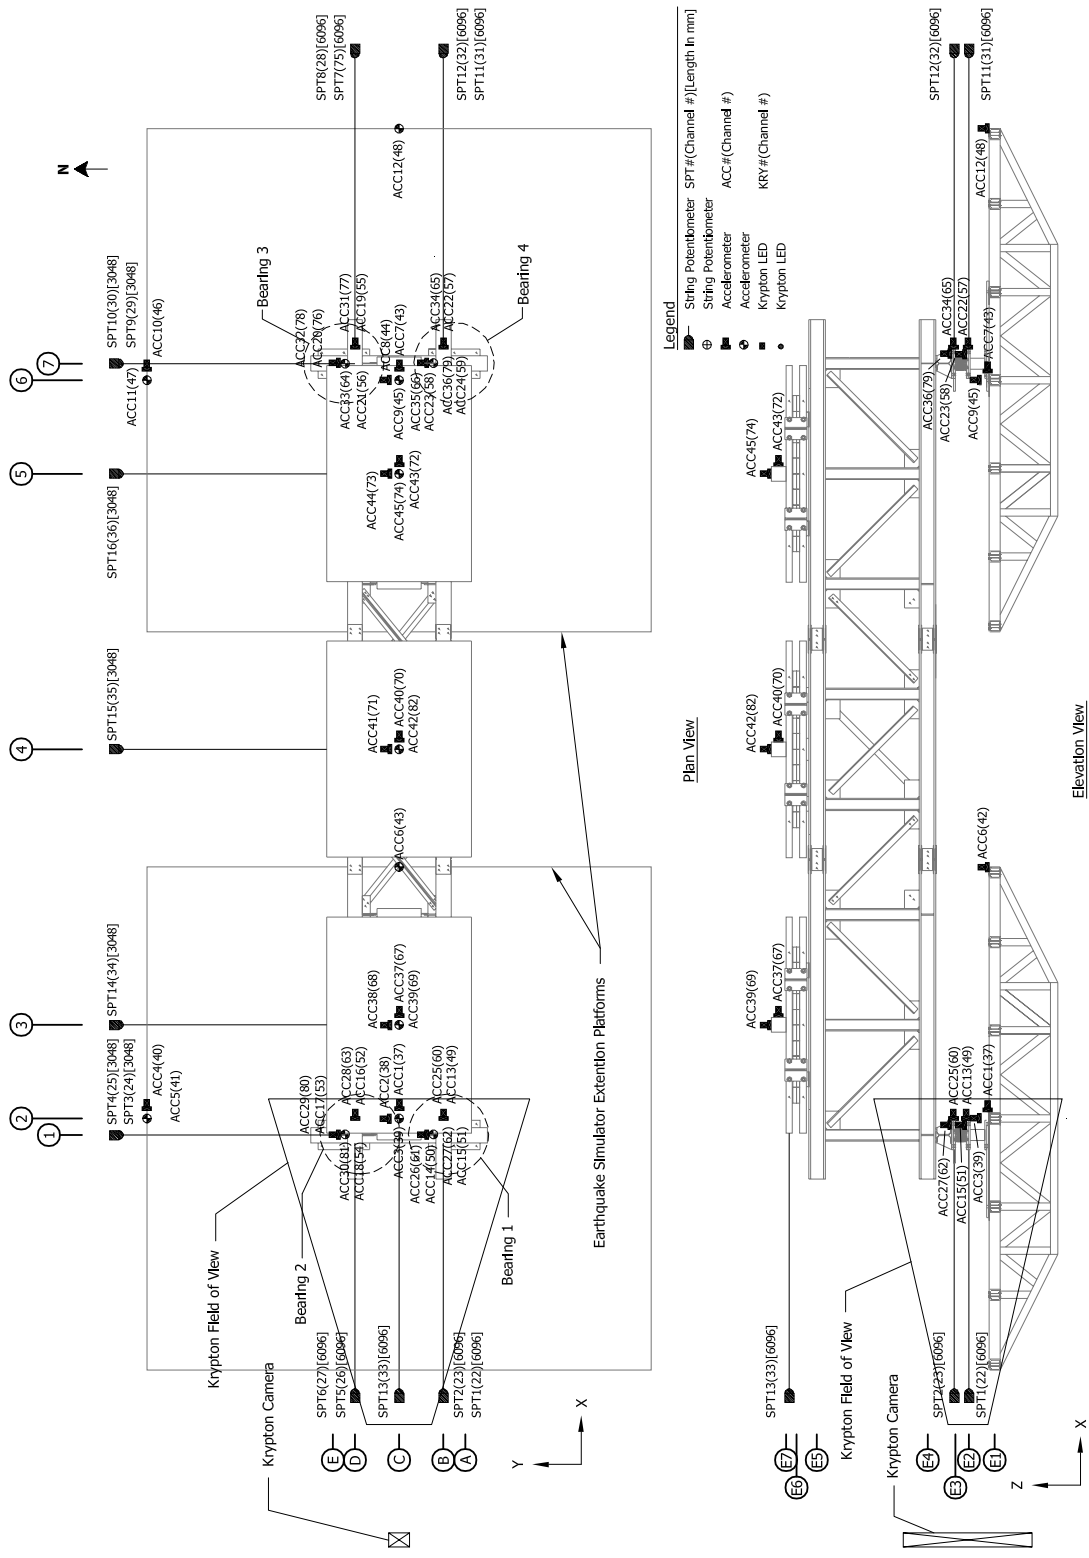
Instrumentation layout shown on elevation and plan views
